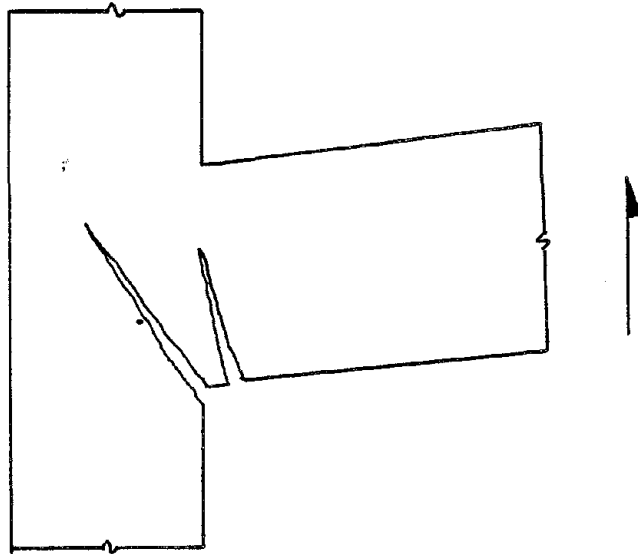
Location of Large Shear and Flexural Cracks in Specimen 11.
